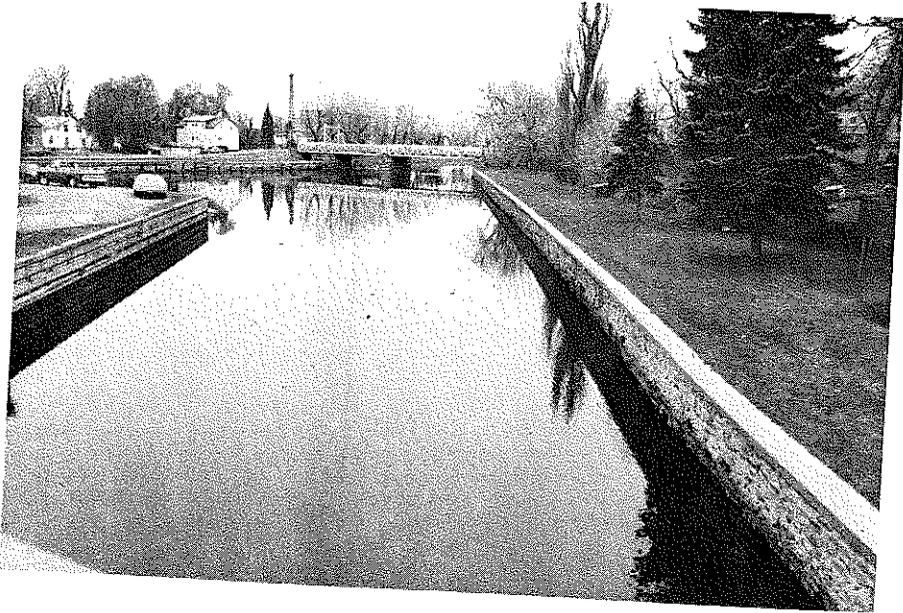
LOOKING DOWNSTREAM FROM GORE STREET BRIDGE TO THE PERTH BASIN AND DRUMMOND STREET BRIDGE
